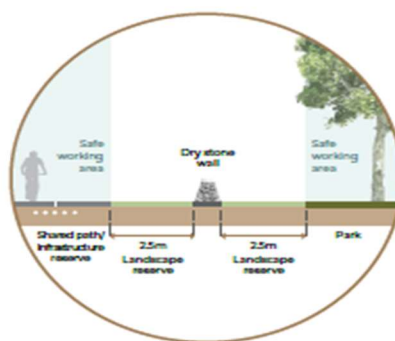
A distance of at least 2.5m between dry stone walls and underground infrastructure minimises safety risks during any works.
